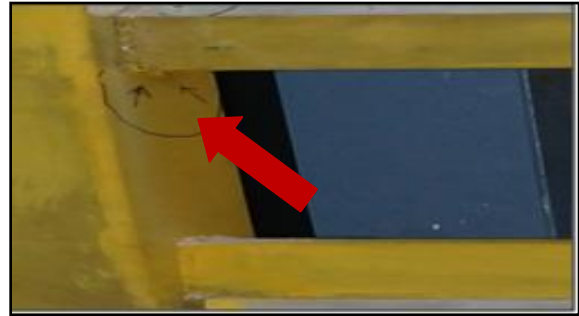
Column Buckling at a Base Shear of 50 kN -Frame (2)
